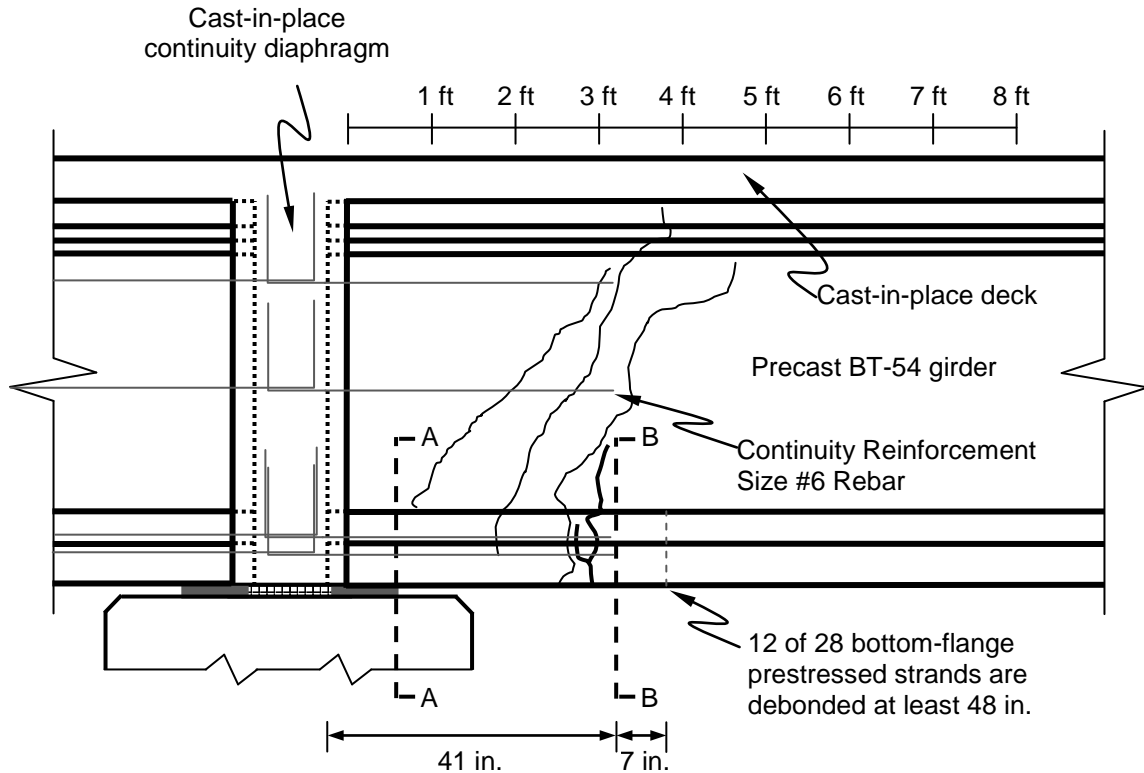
Cracked girder with continuity reinforcement details (Barnes et al. 2006)
